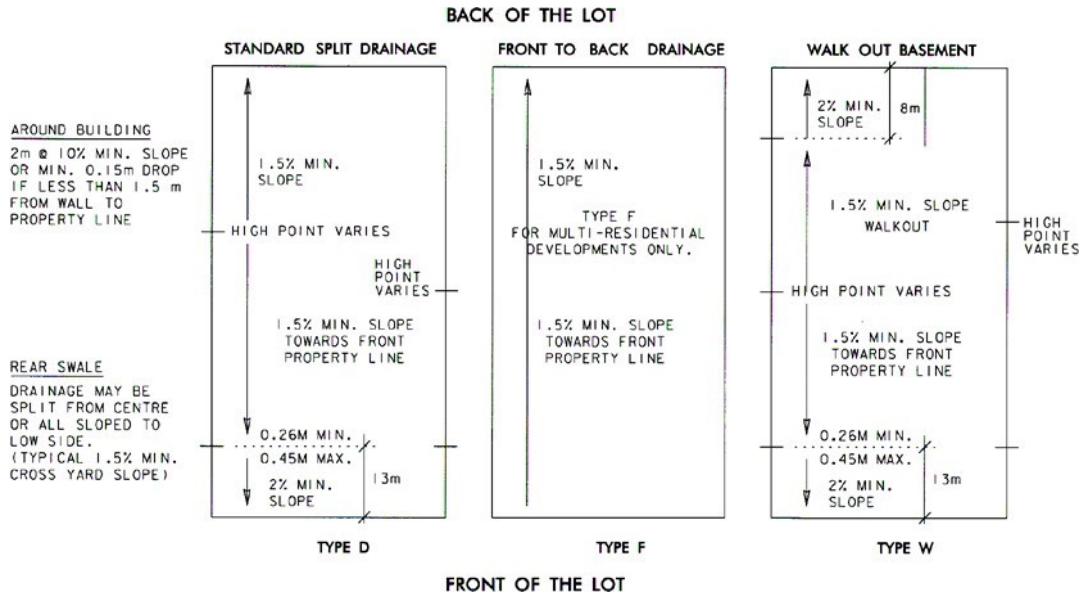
Typical Lot Grading Details – Split/Front to Back Drainage
